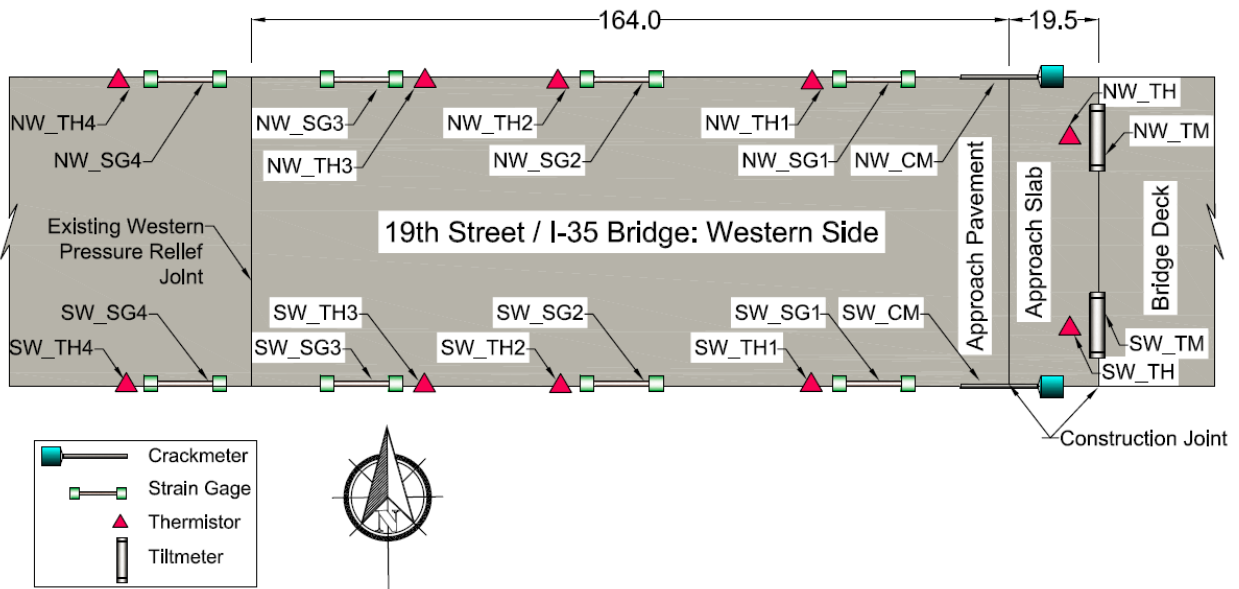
Instrumentation layout for the western side of the 19th Street/I-35 Bridge
